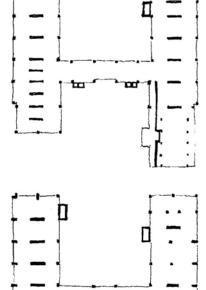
Shear walls are added to the structure to provide lateral stability. These shear walls also help organize enclosed spaces within the departments. (Marisa Baker)
